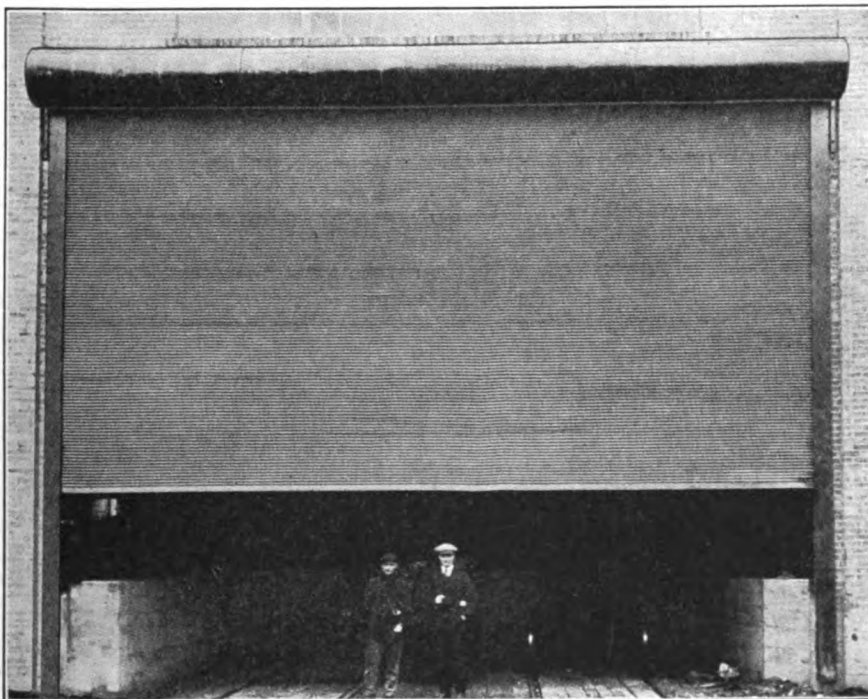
DETAILS OF CONSTRUCTION OF CORNELL ROLLING STEEL DOORS
